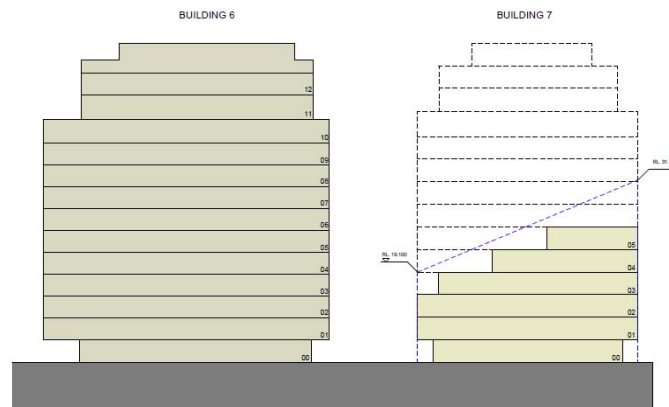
Impact on Building 7 from complying with 60% solar access requirement
